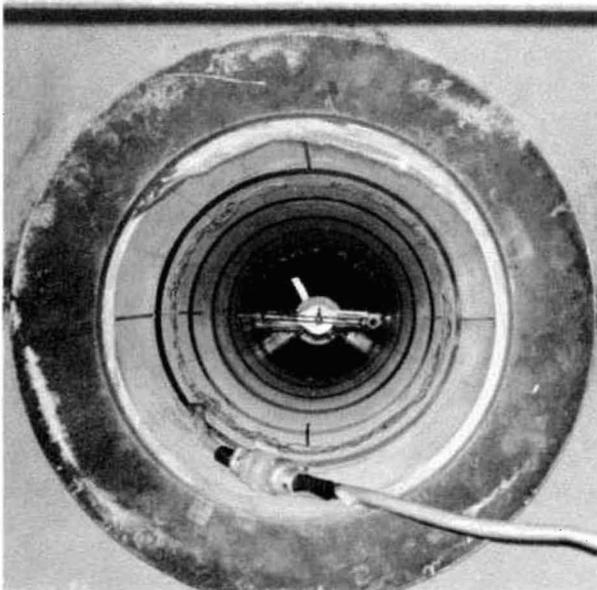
15-inch (38-cm) diameter PVC pipe in soil container prior to loading (Test K). Photo P801-D-73861
